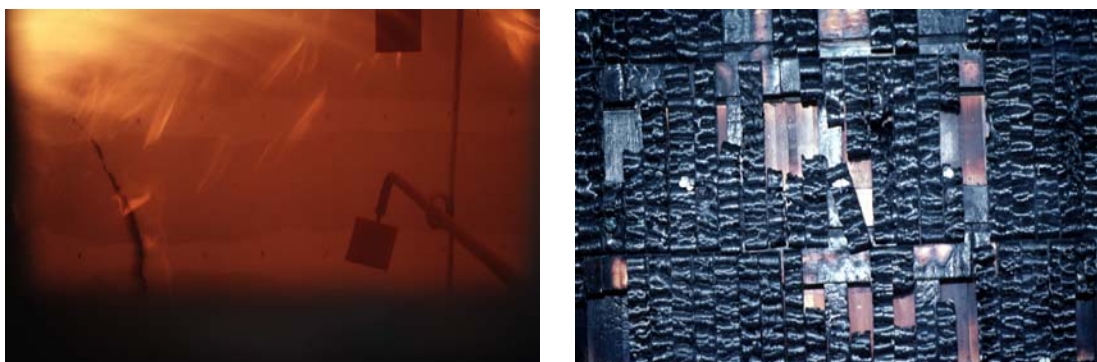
Cracking in the gypsum fibreboard of wall 4 (left) and fire exposed side of wall 4 after the fire test (right).
